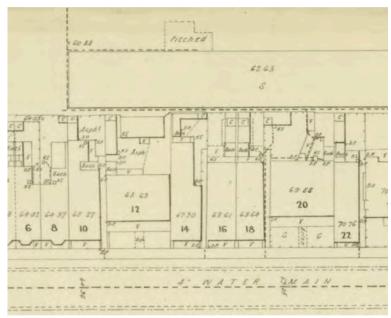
Extract MMBW Detail Plan No. 1358 showing the houses in 1898
